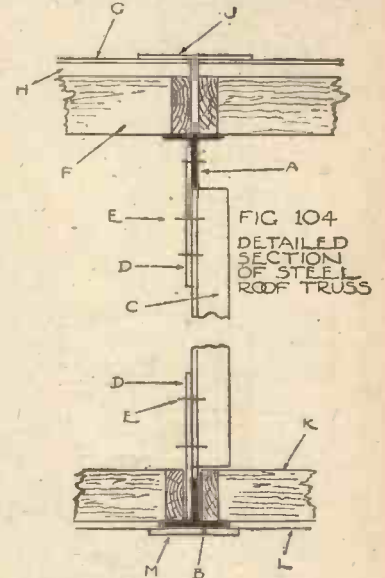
DETAILED SECTION OF STEEL ROOF TRUSS
